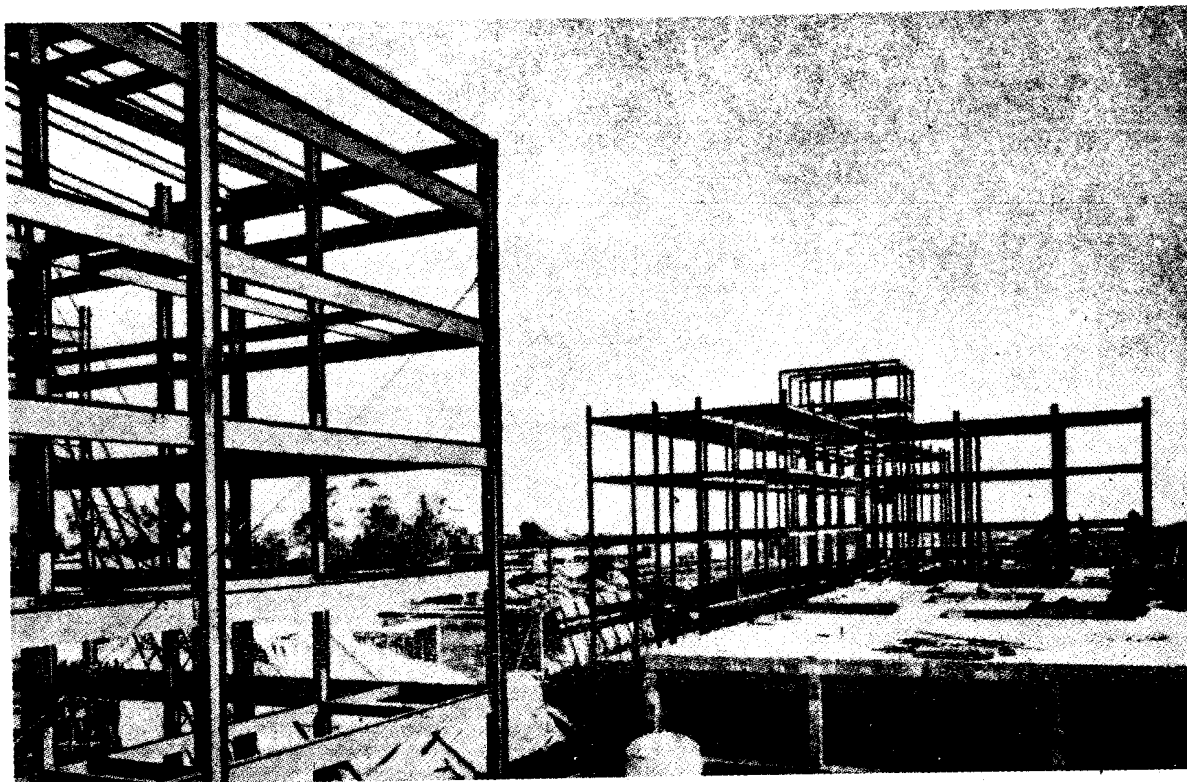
TYPICAL BUILDING COLUMN IN STEEL FRAME
